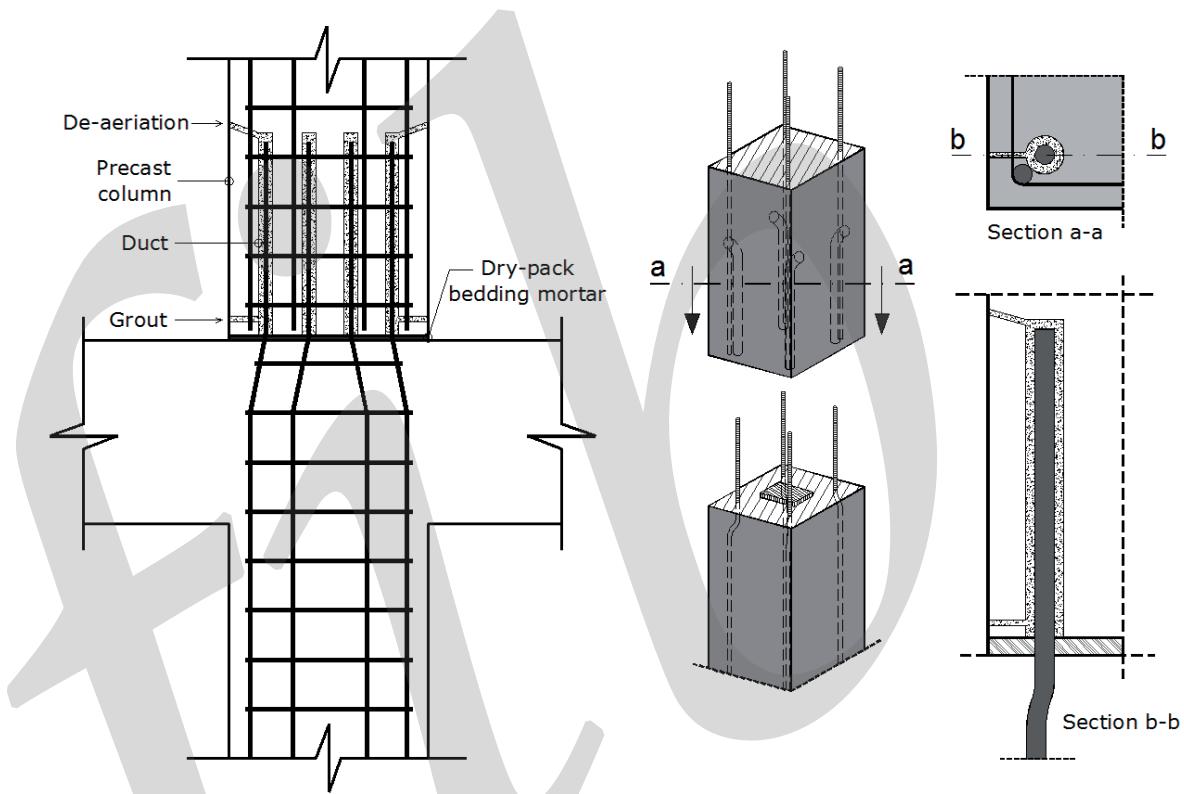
Column-to-column connection with grouted steel sleeves
